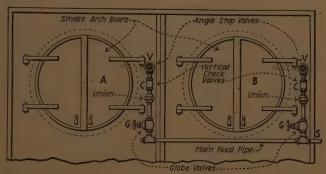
Feed pipe connections to two horizontal return tubular boilers.
